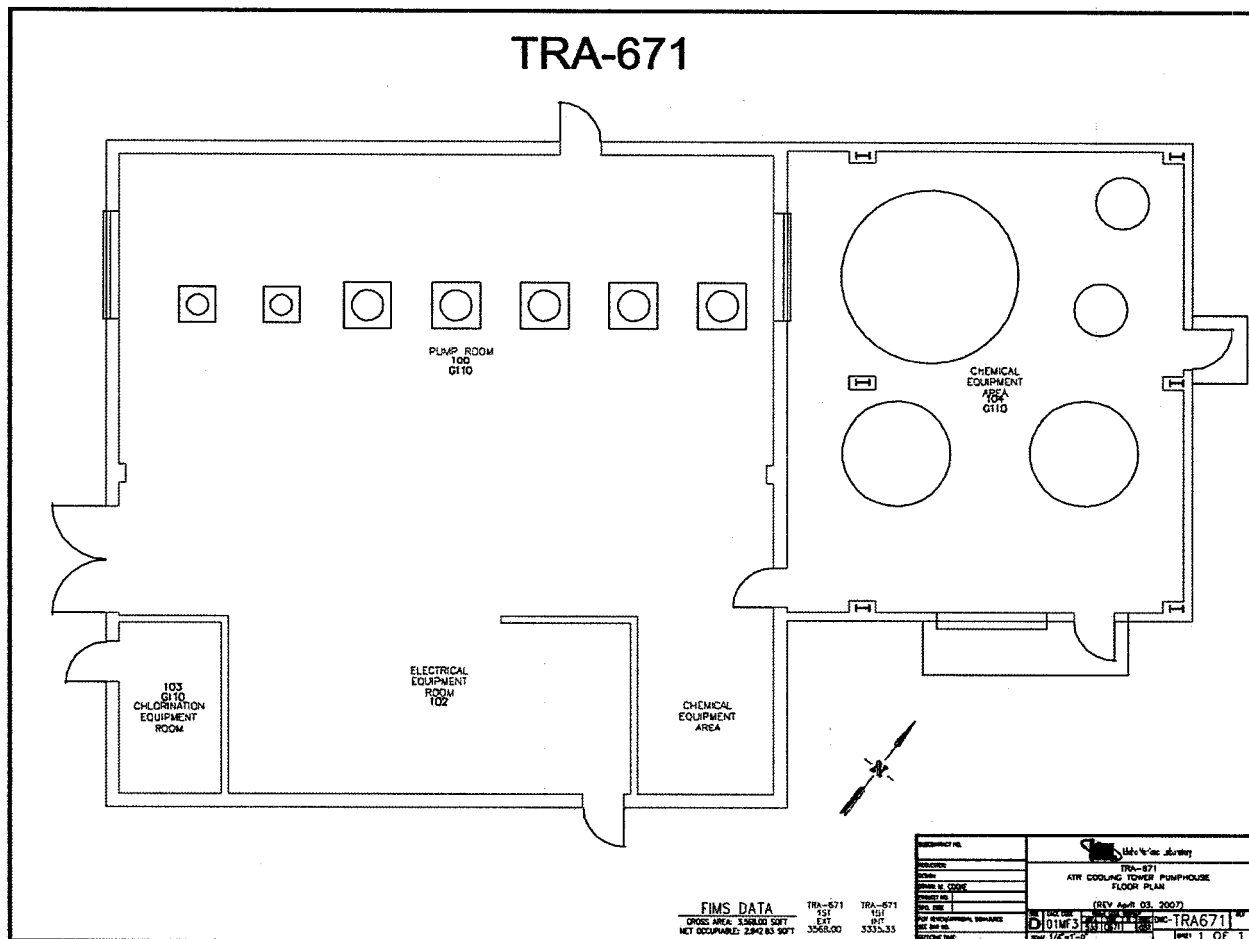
Floor plan for TRA-671, Advanced Test Reactor Cooling Tower Pumphouse.
